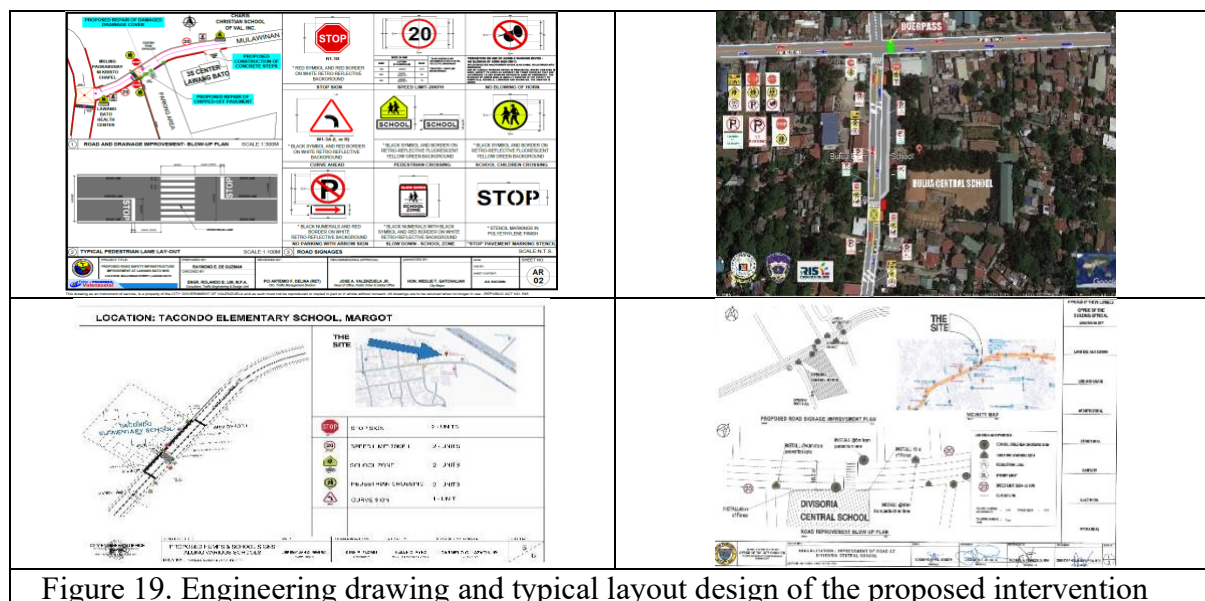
Engineering drawing and typical layout design of the proposed intervention
